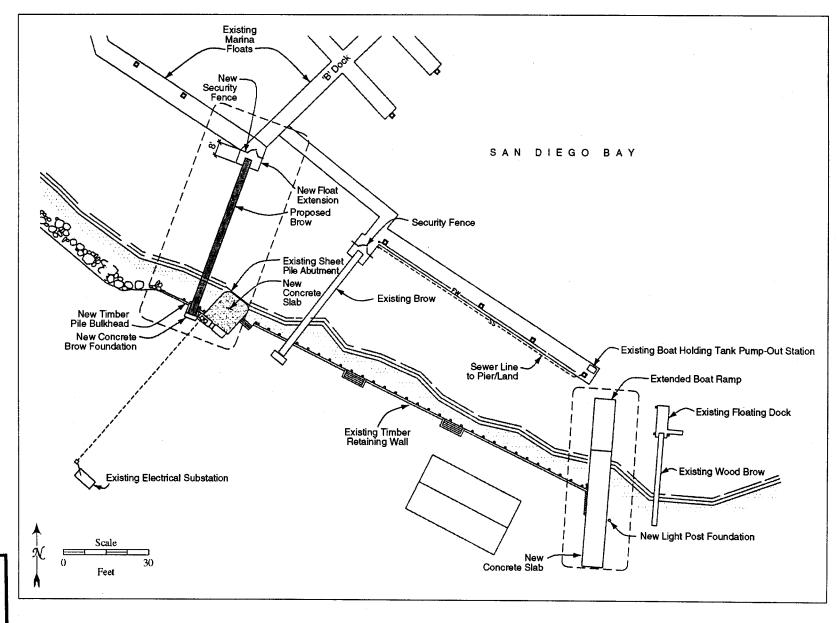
Details of Proposed Brow Construction and Boat Ramp Exter
